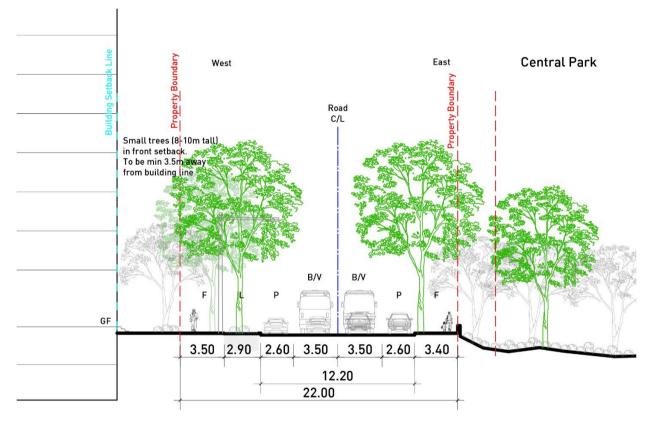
Type 1B Major Road Central Park Interface (NSR 2 between EWR 4 and EWR 6)
